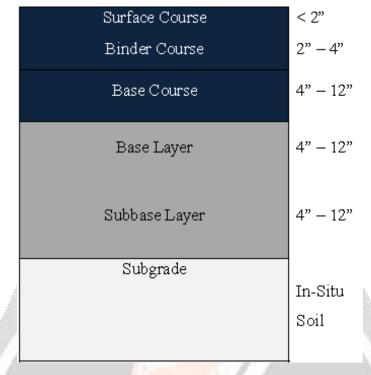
Typical Asphalt Pavement Cross Section (Katamine, 2000)
